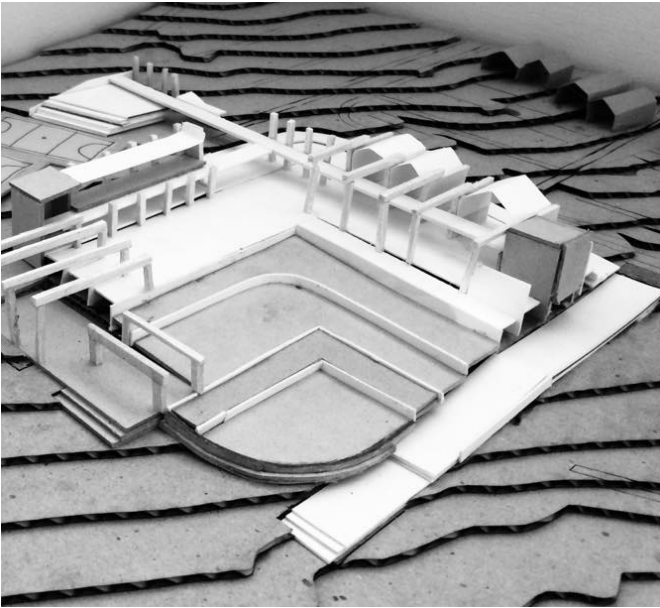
Design iteration six on plan (Author, 2018)
